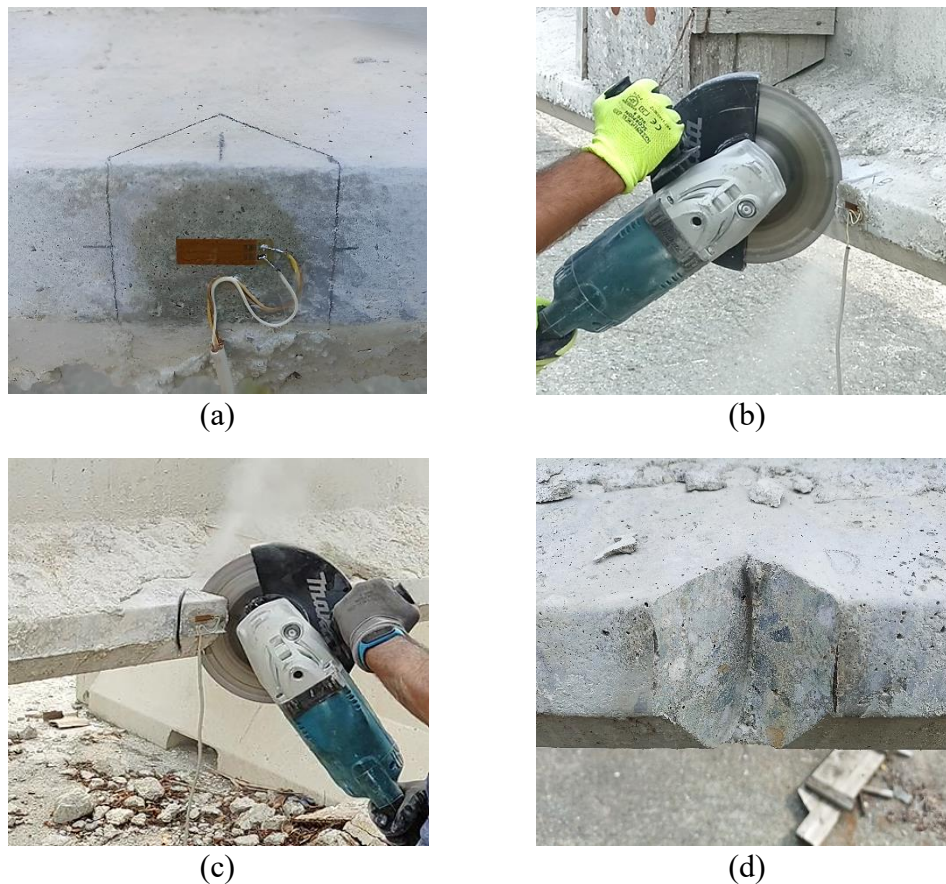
Saw-cut test: (a) strain gauge setup, (b) left side cut, (c) right side cut, (d) triangular prism shape.
